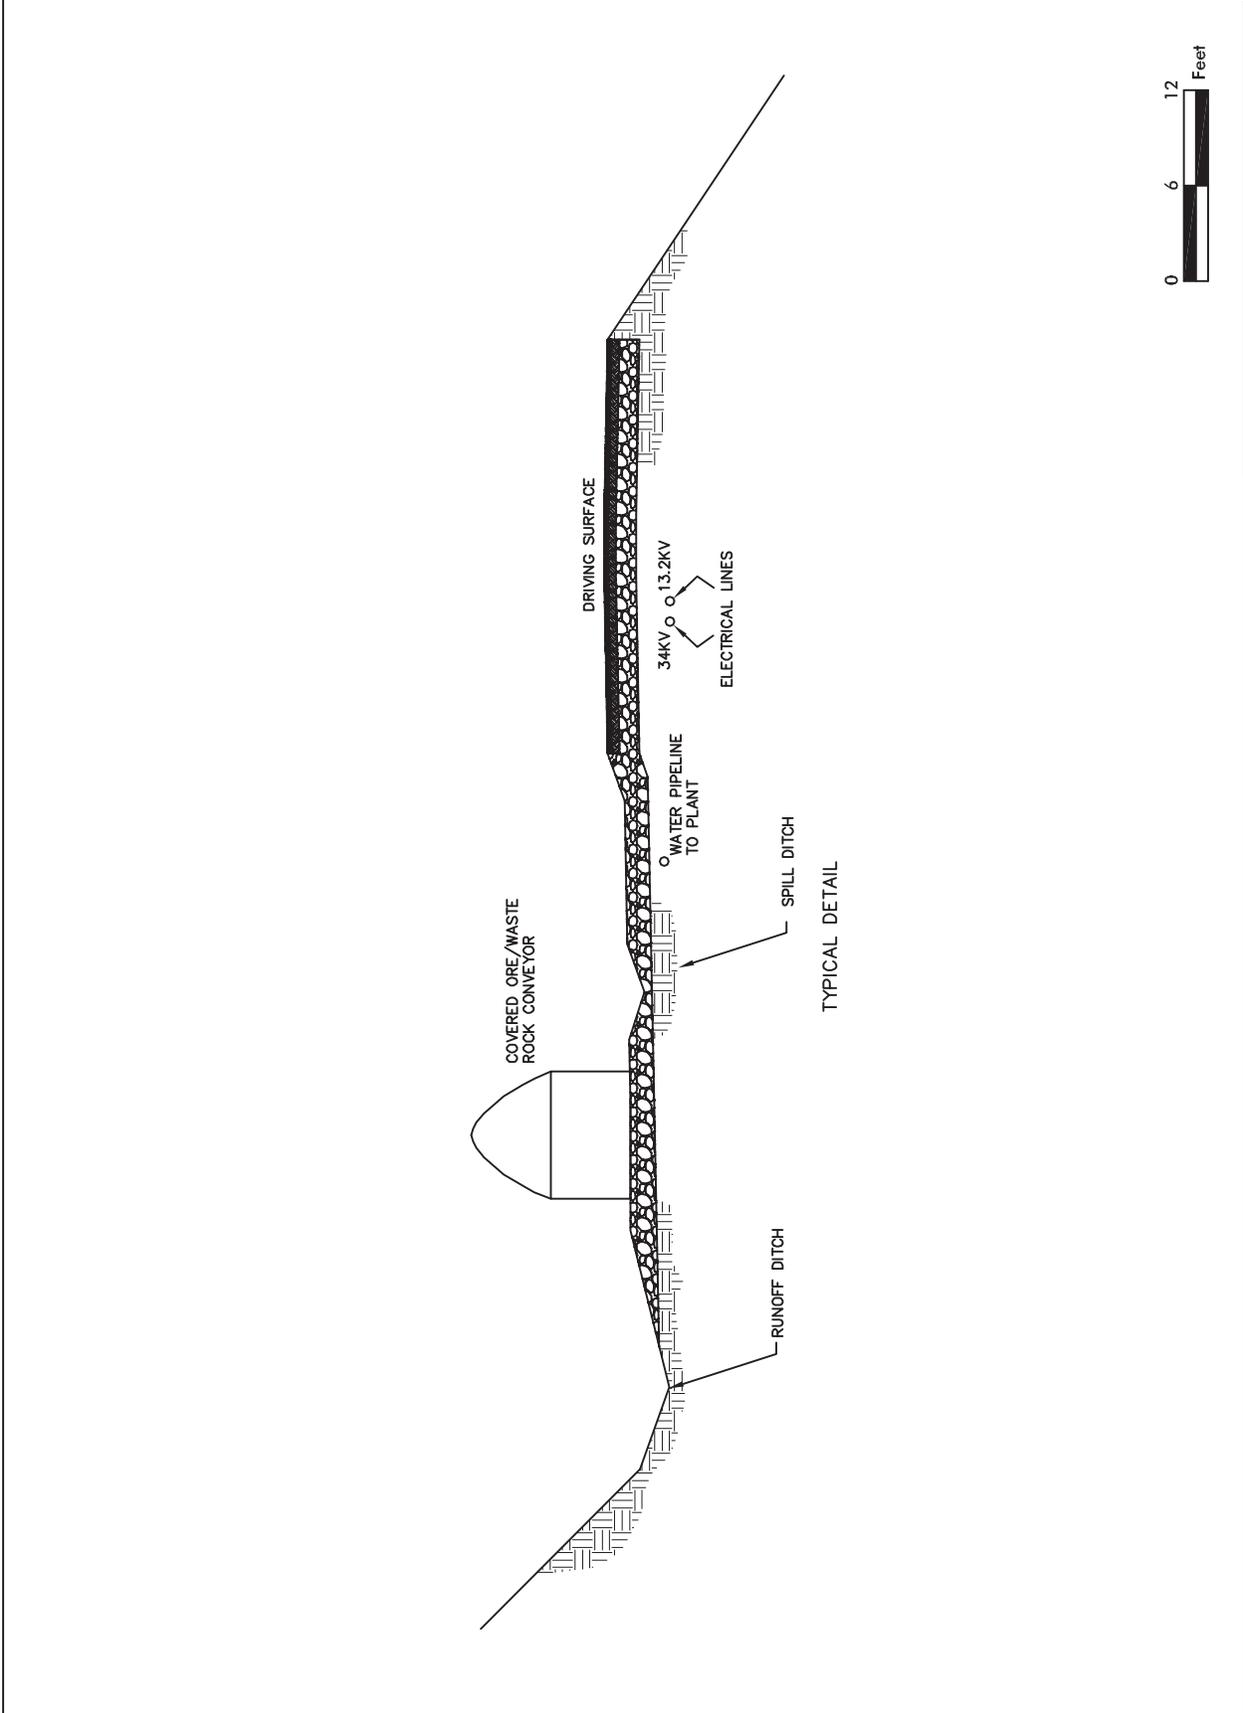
Detail of Overland Conveyor and Libby Adit Access Road, Alternatives 3 and 4
